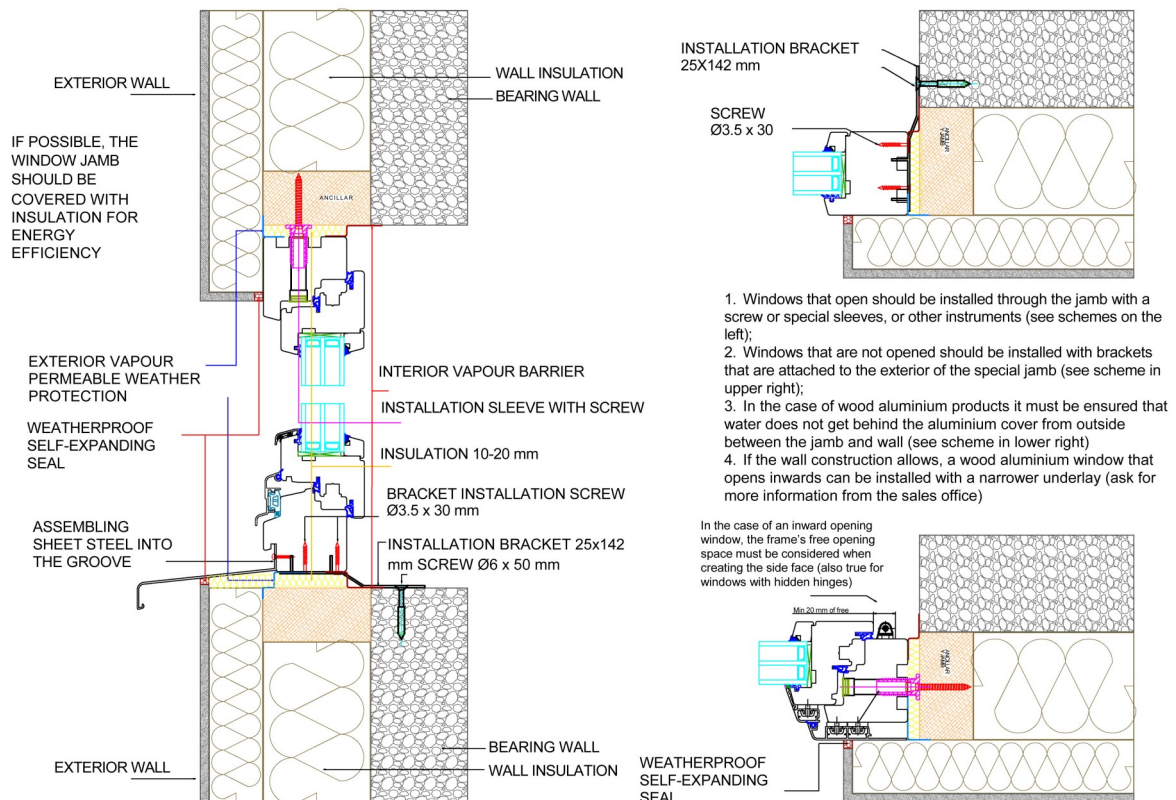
The installation schemes of inward opening DK13 and DK88 windows, balcony doors, and sliding doors
